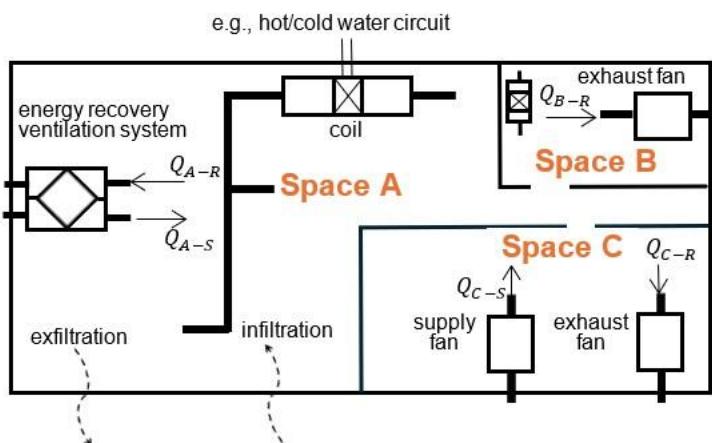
An example of a floor or a section of buildings, where spaces with different needs of space heating and cooling and ventilation are contained
